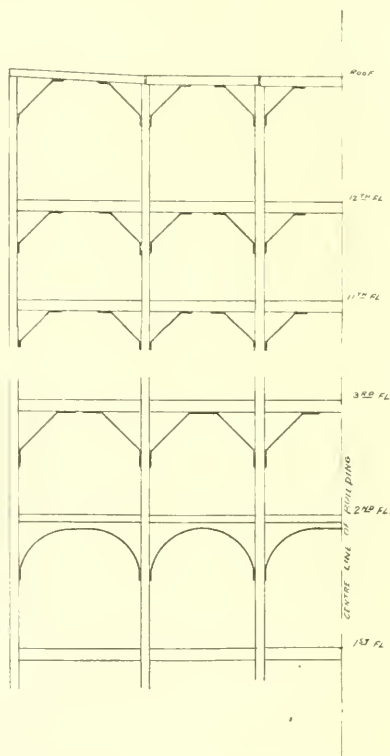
KNEE BRACING, LEES BUILDING, CHICAGO.
